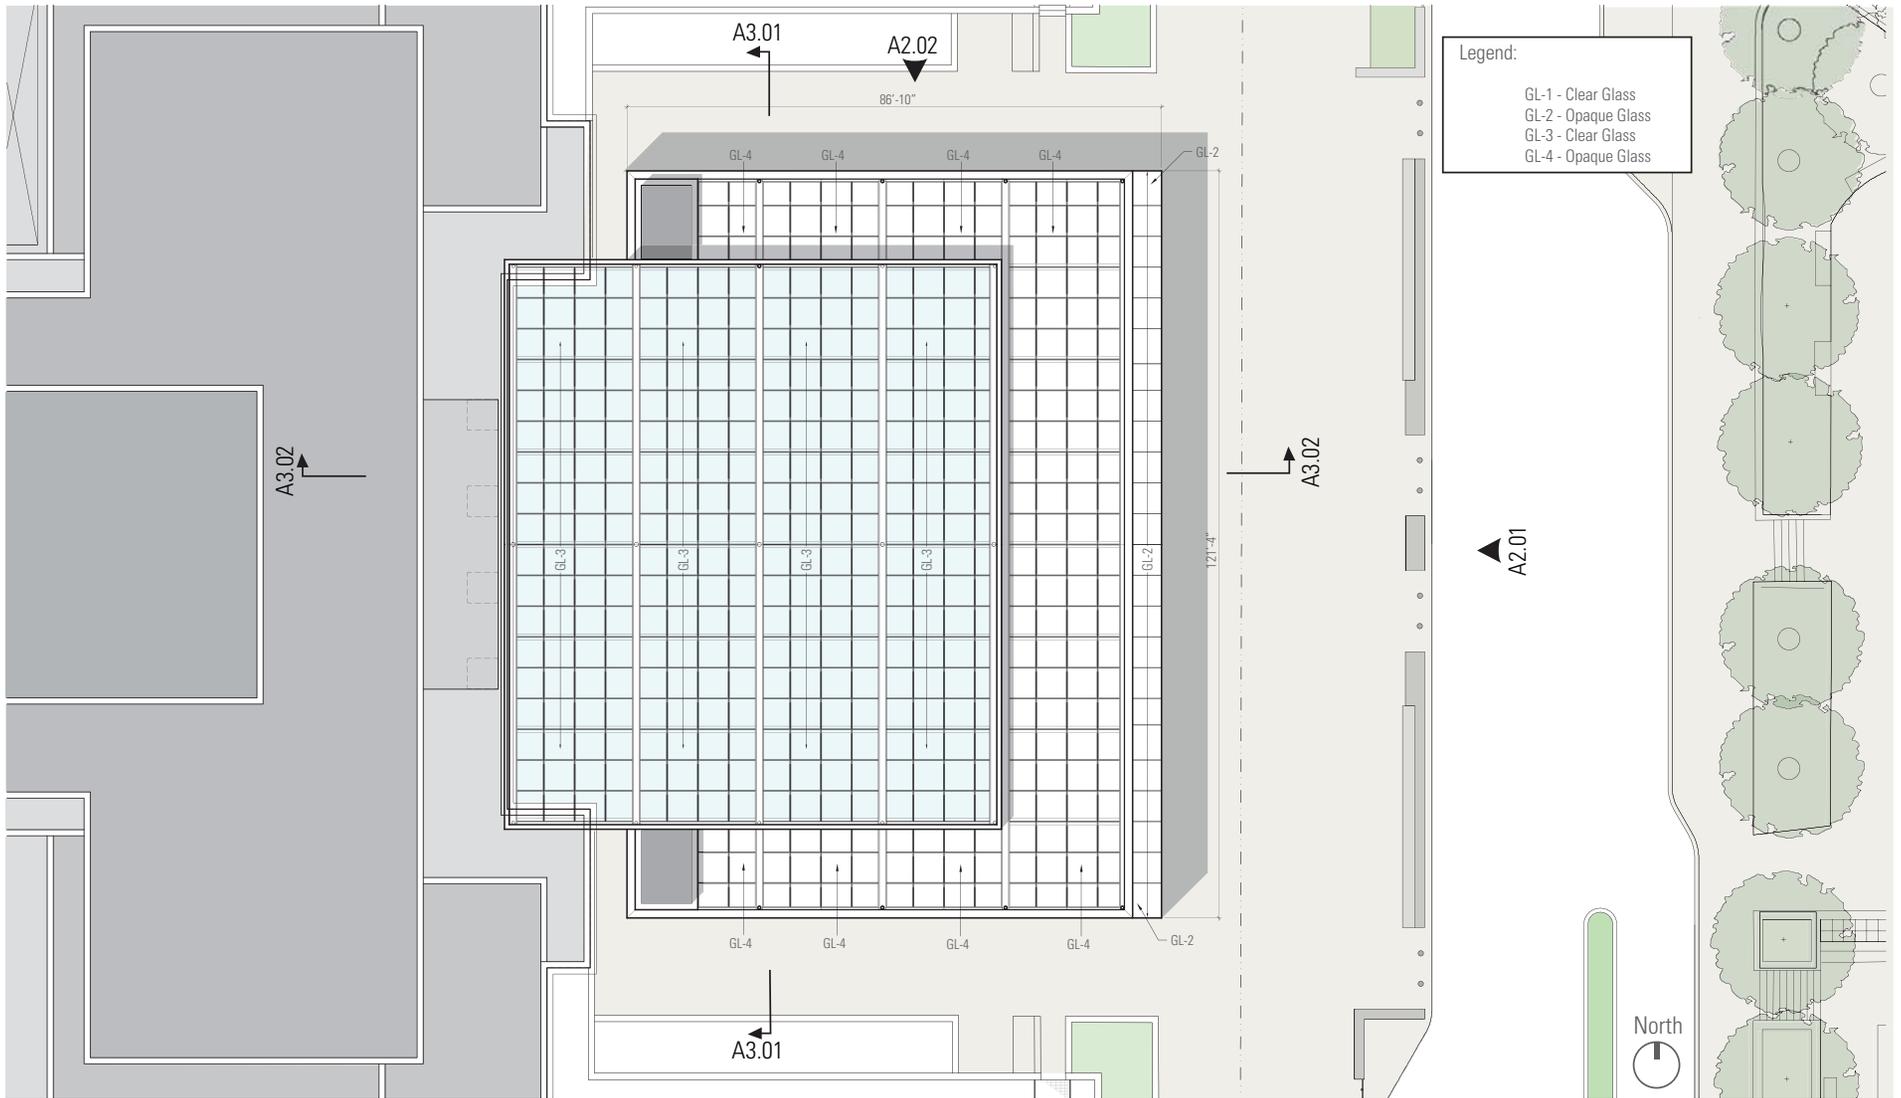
USDC Entry Pavilion: Roof Plan
